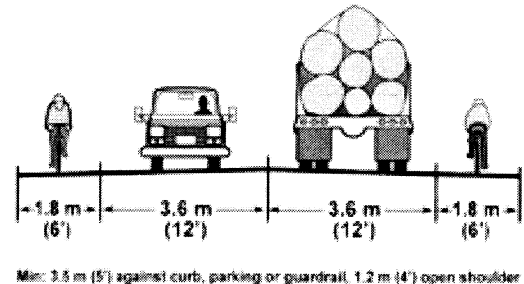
Cross-section of shoulder bikeway along two-lane open section road or highway (Source: Oregon Department of Transportation)
